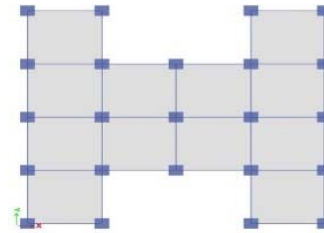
Plan view of 5 stories H-Shape building with and without base isolation
